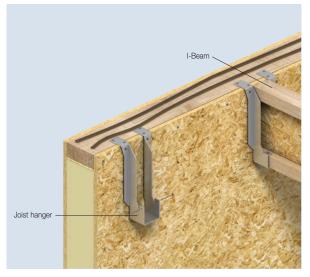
Locating and Fixing Joist Hangers For First Floor Deck
